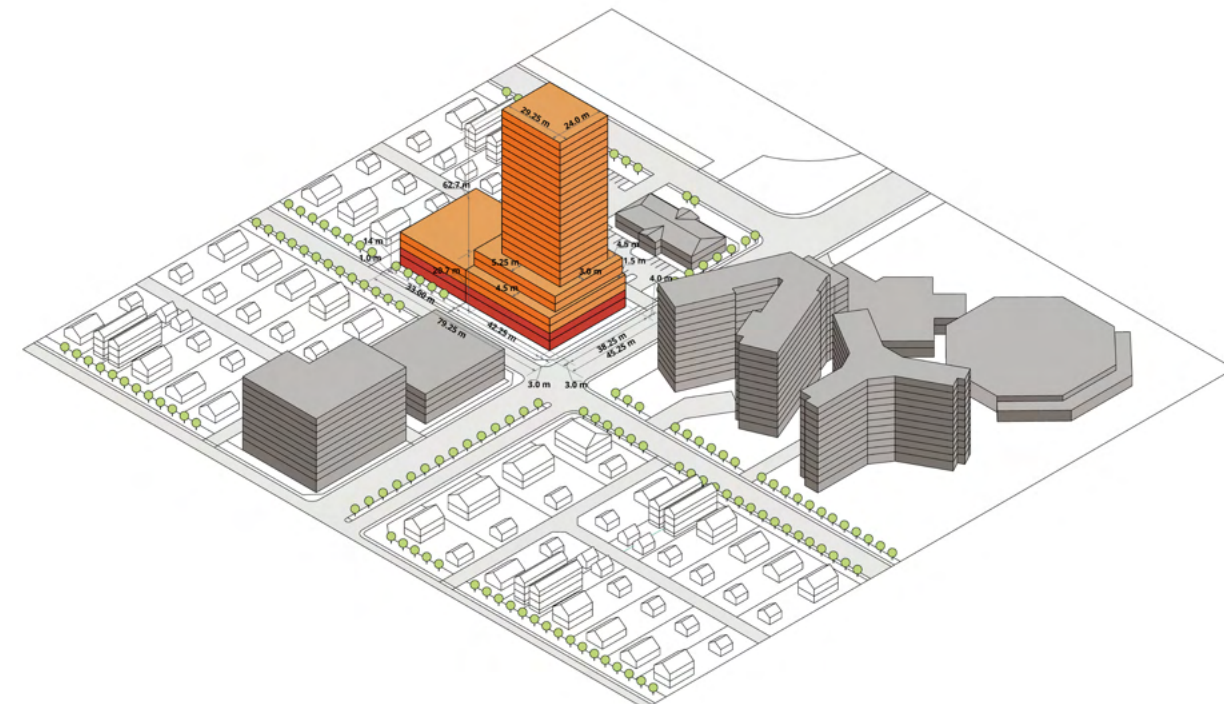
Previous Concept Massing Model - 25 Storey Building (6 & 4 Storey Podium)
